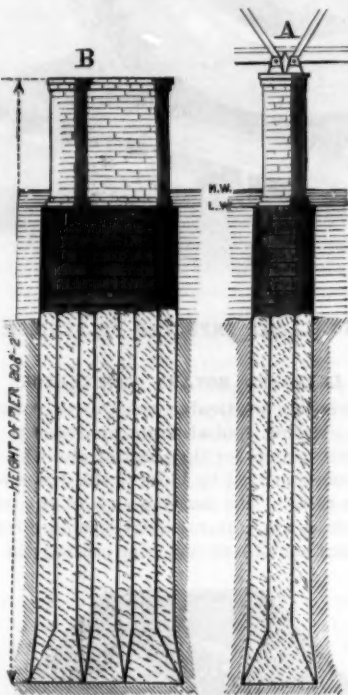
SECTIONAL ELEVATION OF PIER.
